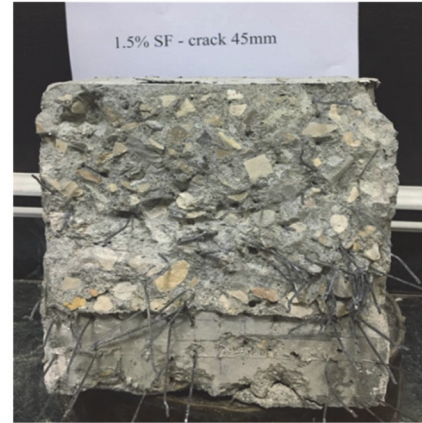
illustrates the fracture surfaces of MC DNC specimens with fibers uniformly distributed throughout the entire specimen and a fabricated MC surface with a $V_f\%$ equal to 1 and 1.5%. The fracture surfaces show that the hooked-end steel fibers were well-distributed and failed by pullout, as clearly seen in the MC DNC specimens, see Fig. 10.c. The presence of the fibers ahead of the crack tip is crucial for preventing a sudden and brittle failure after the peak load, instead allowing for more ductile mode II crack growth. The crack path, which passed directly through the coarse aggregates, indicates a trans-granular fracture. This was caused by an excellent aggregate-mortar bond, which in turn prevented energy dissipation that would typically occur from crack deviation or aggregate bridging.
